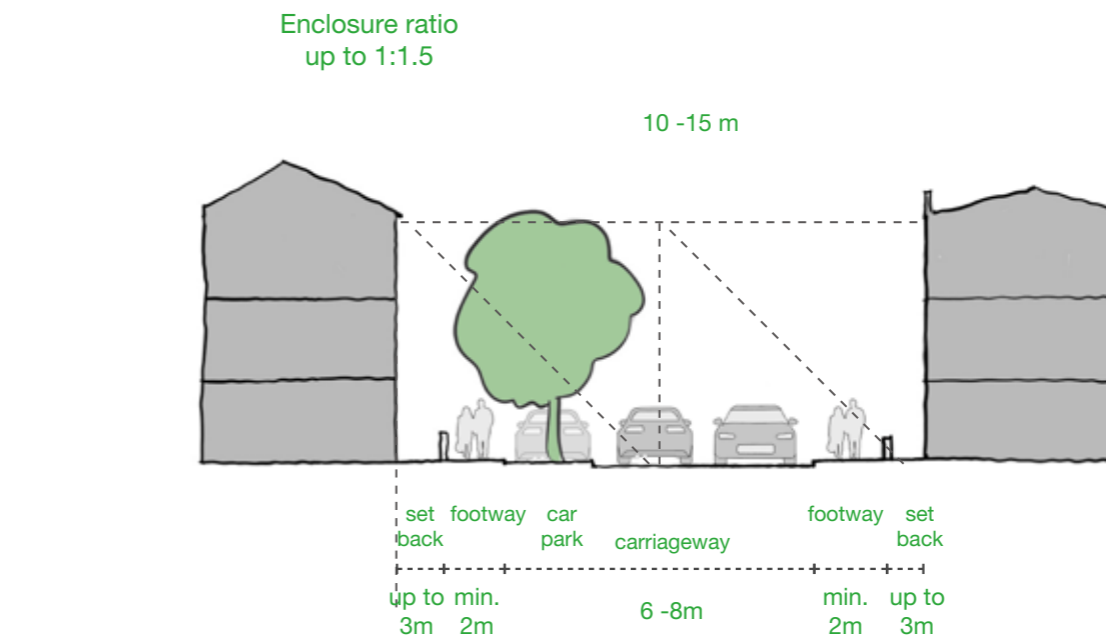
Typical street section of urban street with traffic in Lichfield City Centre area
